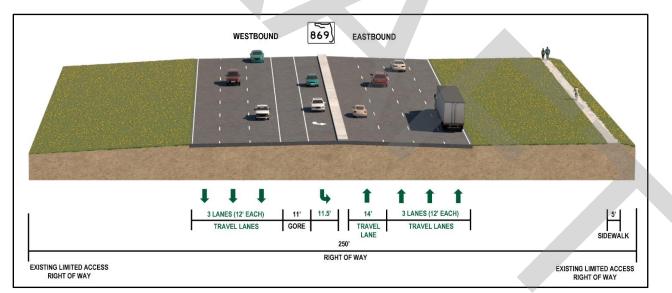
No-Build Alternative SW 10th Street Roadway Section between Florida's Turnpike and Powerline Road
